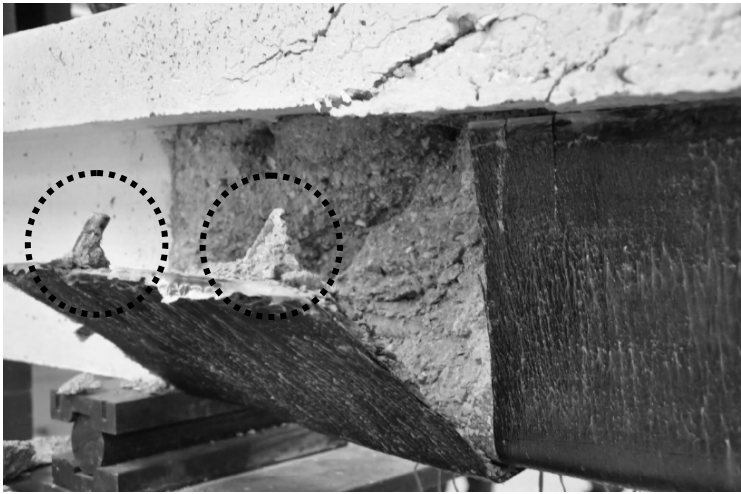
Fibr™ Anchors on a beam after testing and removing the FRP system (Structural Materials Laboratory - University of Patras).
